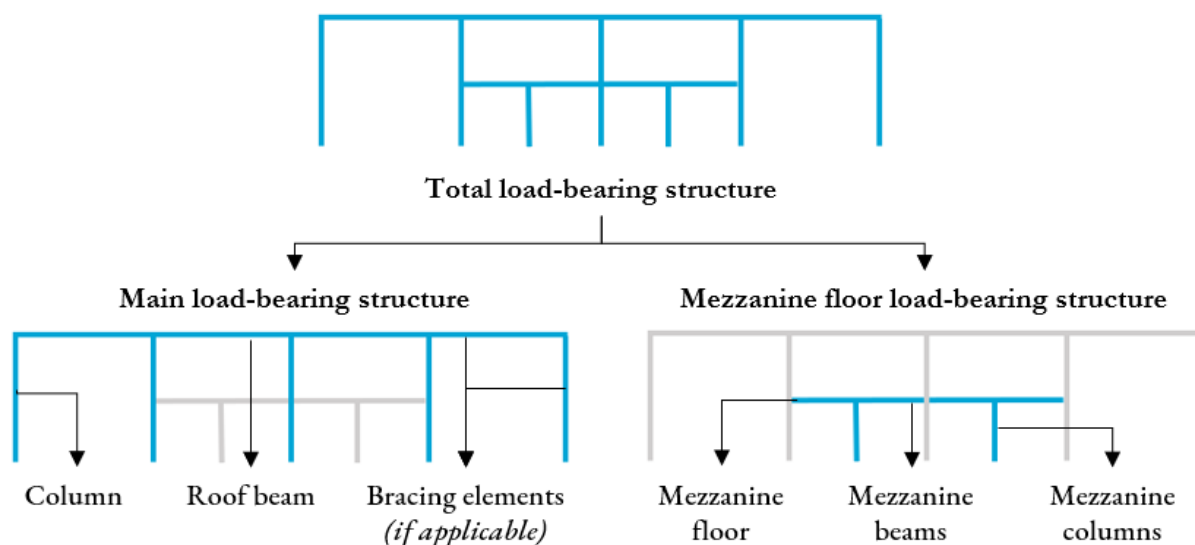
Separation of the total load-bearing structure into the main and mezzanine floor load-bearing structure
